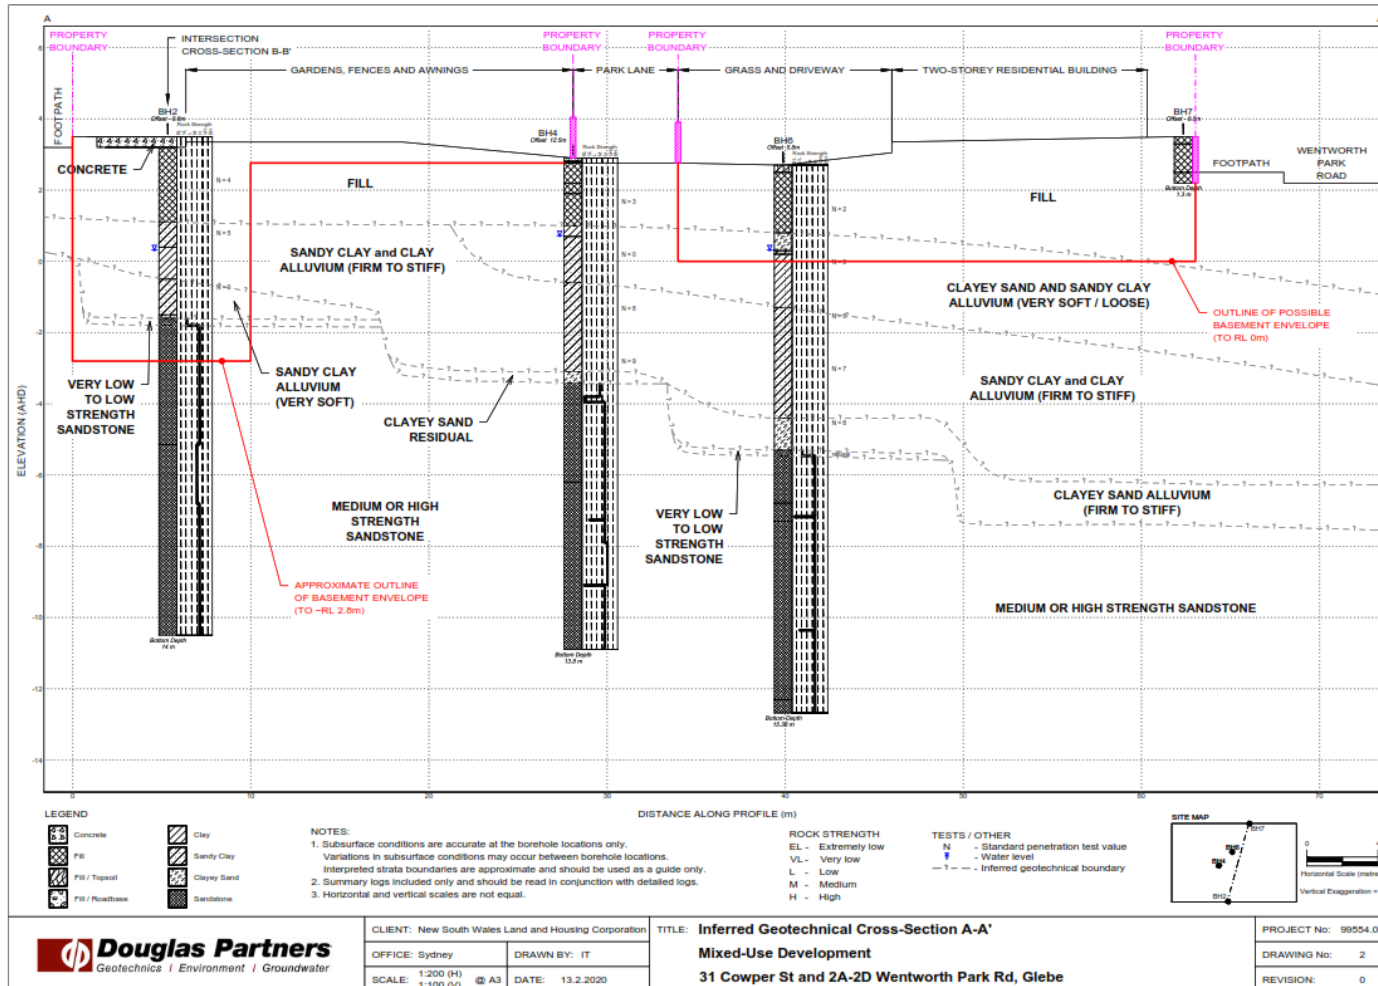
Inferred Geotechnical Cross-Section A-A following geotechnical investigation carried out January 2020. (Source: Douglas Partners, 2020 p 39).
